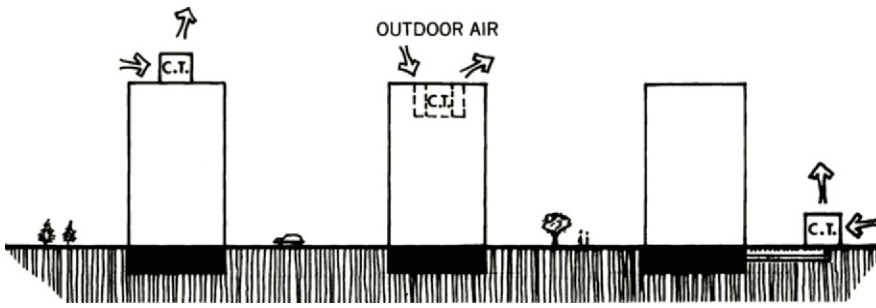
When the mechanical equipment is mainly in the basement, the cooling tower should still be on the roof or on an out-of-the-way location with good outdoor air circulation.
